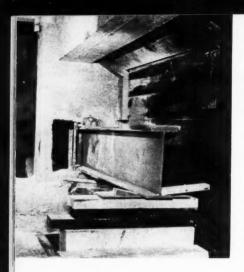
To carry existing concrete footings down 16 ft along building edge, where machinery required all shoring to be done
